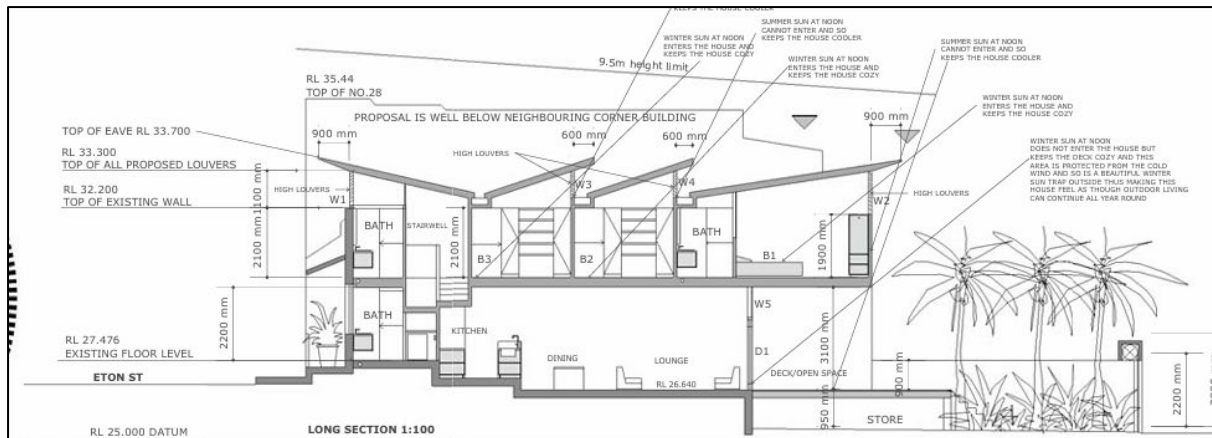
No. 28 Eton Street Section Diagram as Approved under DA201300194
